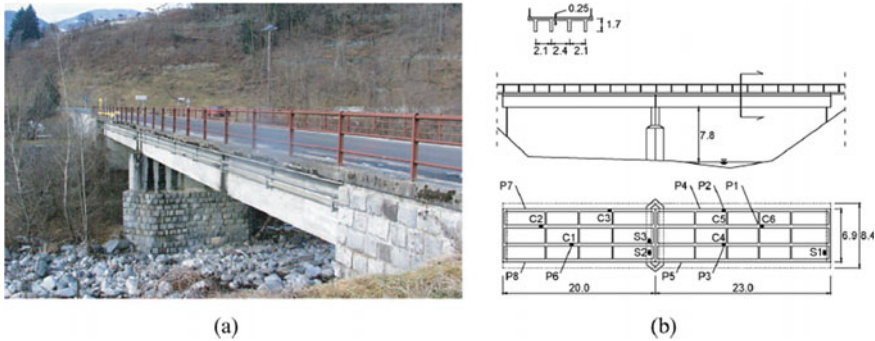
SP65 bridge on Maso River: a overview; b plan view, elevation and cross section of the deck [37]
